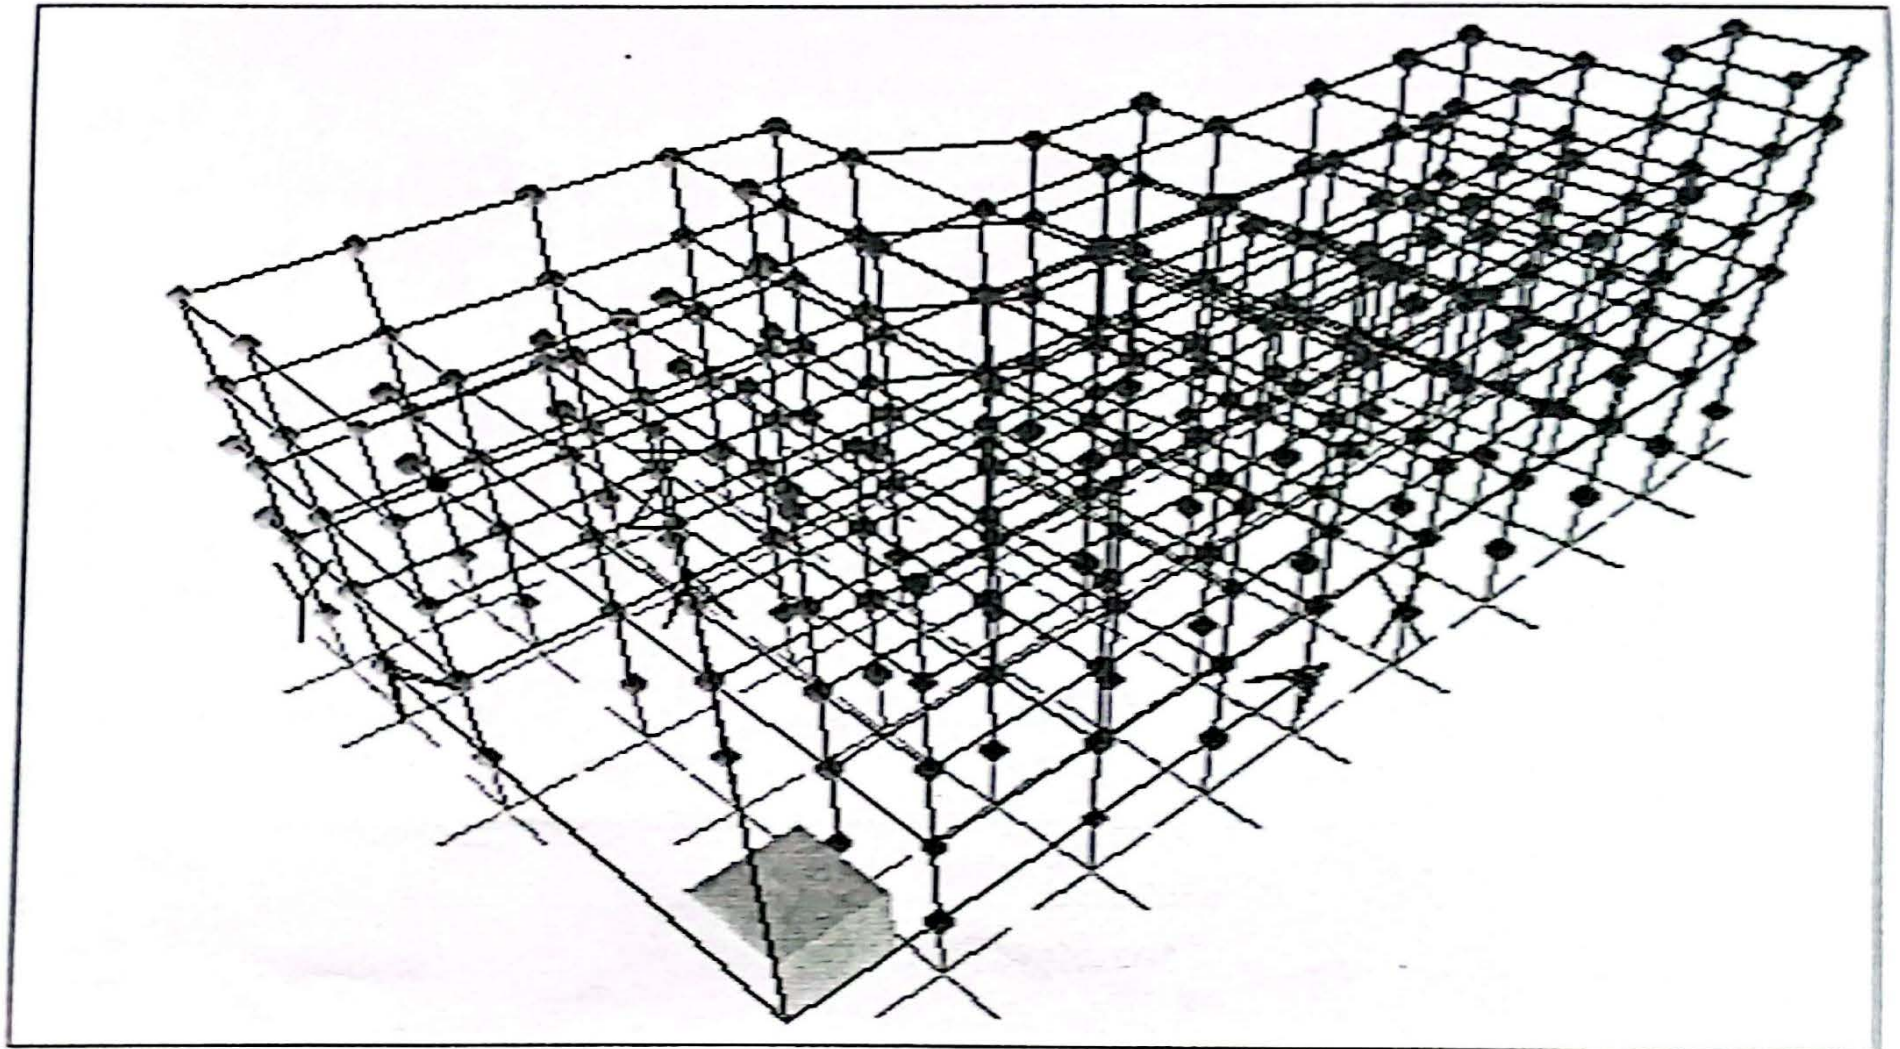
3D FRAME STRUCTURE (UNDEFORMED)
